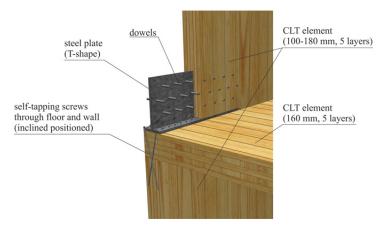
Dowel-type connection with steel plate in between the wall element for efficient joint design
